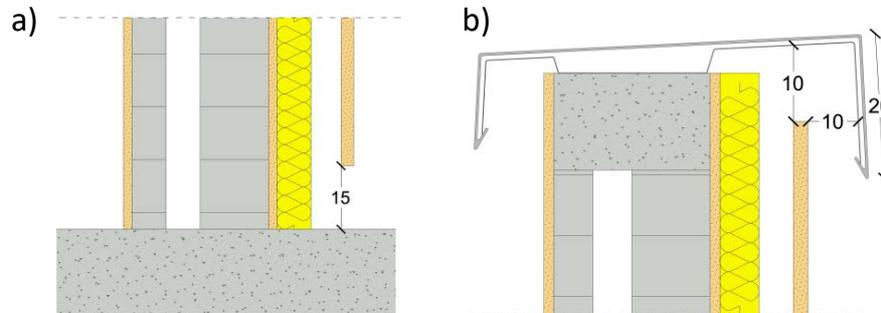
Inlet (a) and outlet (b) sections of ventilated facade. All measures are expressed in cm
